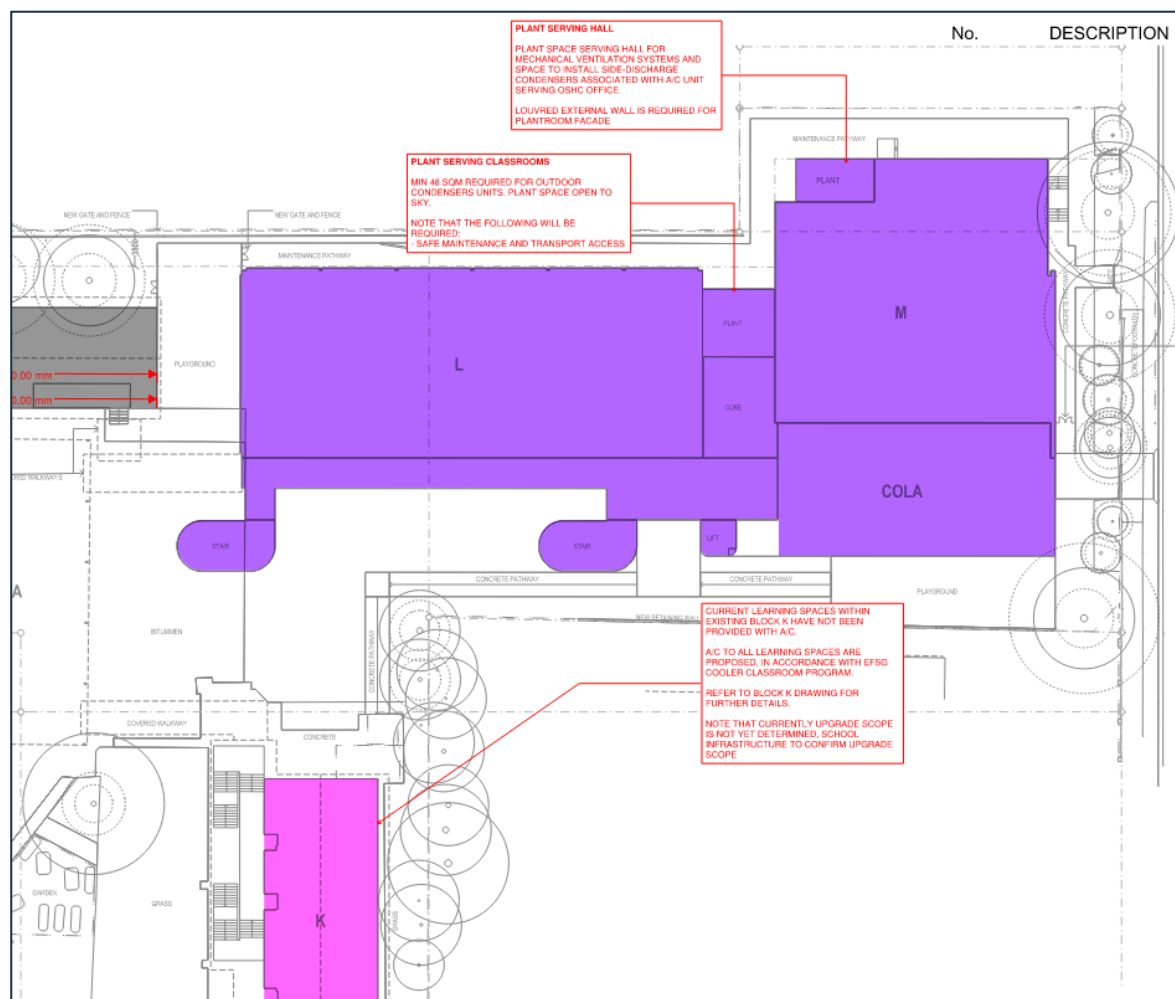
CONCEPT LOCATION FOR MECHANICAL PLANT IN NEW BUILDING
